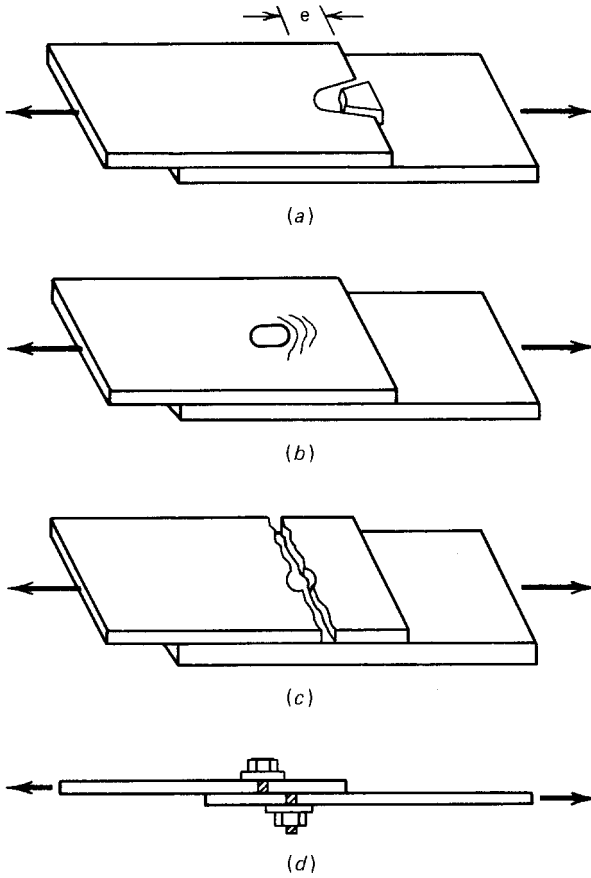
Types of failure of bolted connections. (a) Longitudinal shear failure of sheet (type I). (b) Bearing failure of sheet (type II). (c) Tensile failure of sheet (type III). (d) Shear failure of bolt (type IV).
